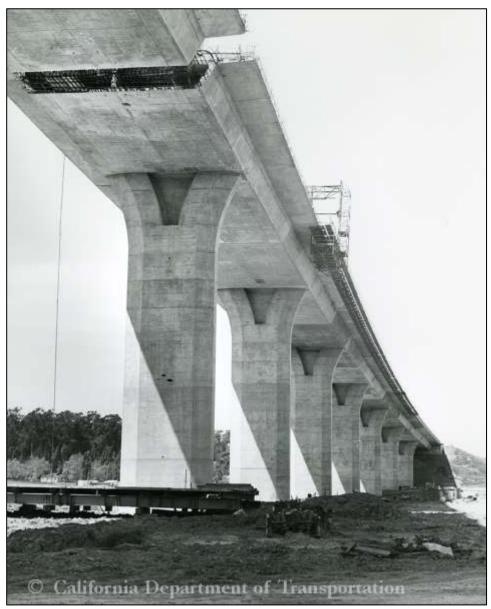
Napa River Bridge under construction. This view is looking west from about mid-span.⁵
